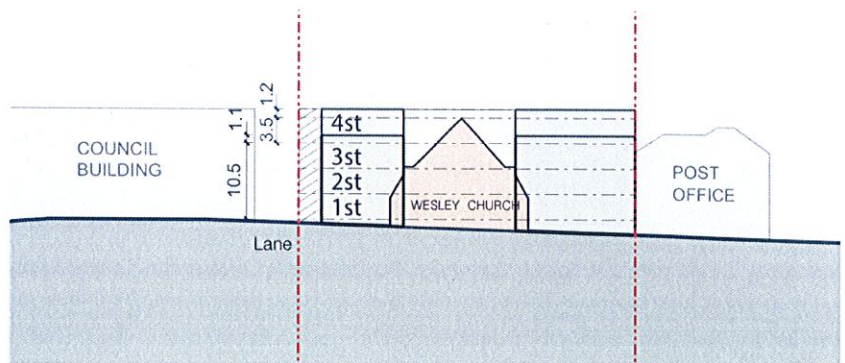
Wetherill Street _ Building envelope Commercial floor heights Section B-B
